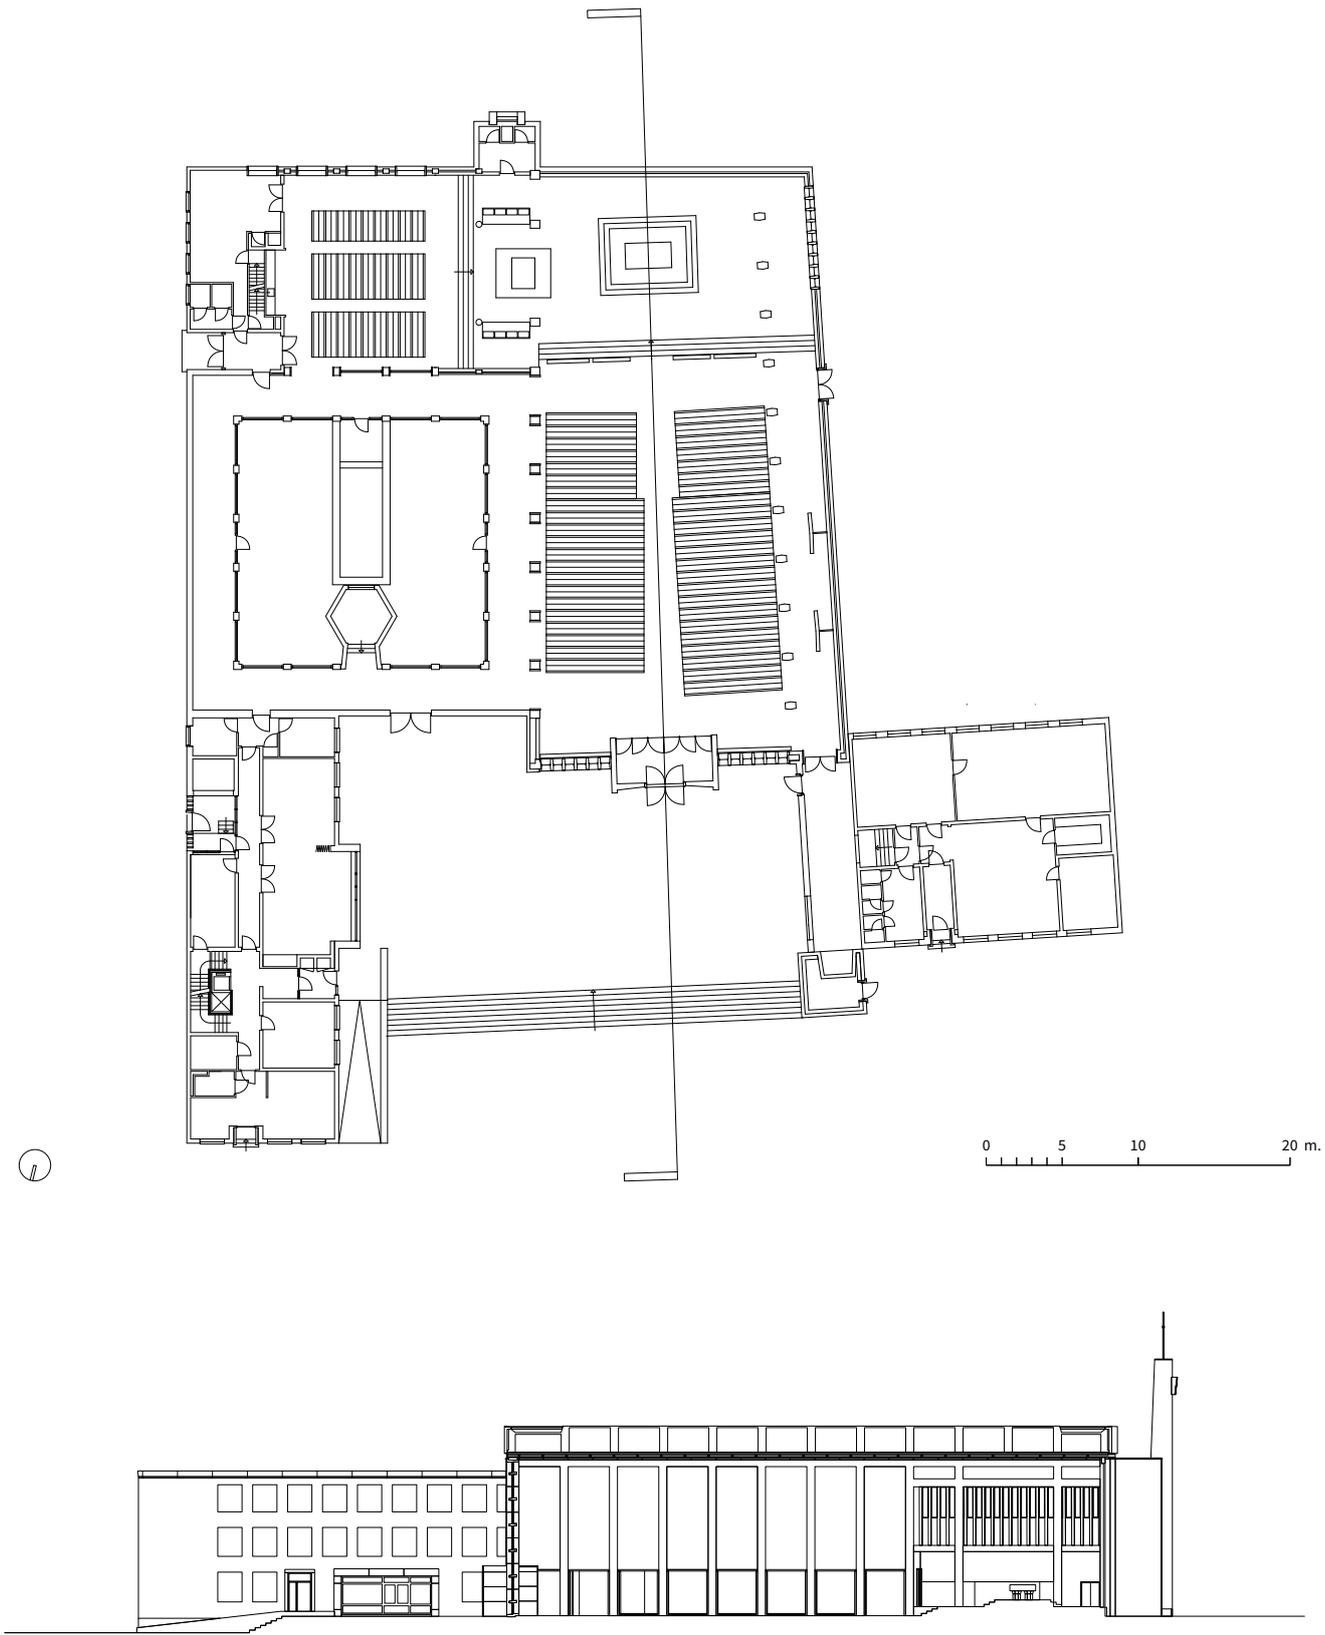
Floor plan and section of the St. Dominic Church in Rotterdam, scale 1:500. Own work.
